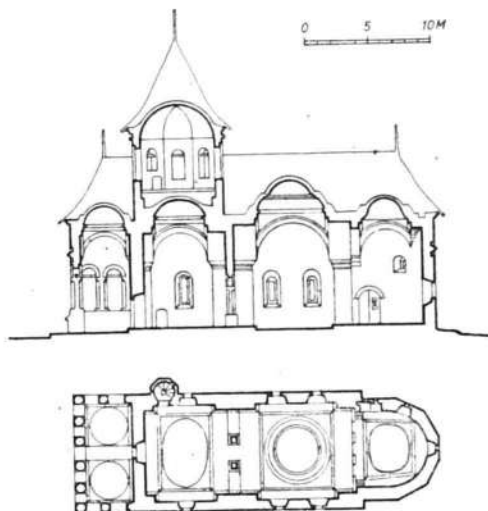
St. Nicholas church in Făgăraș. Plan and section. Western porch.
